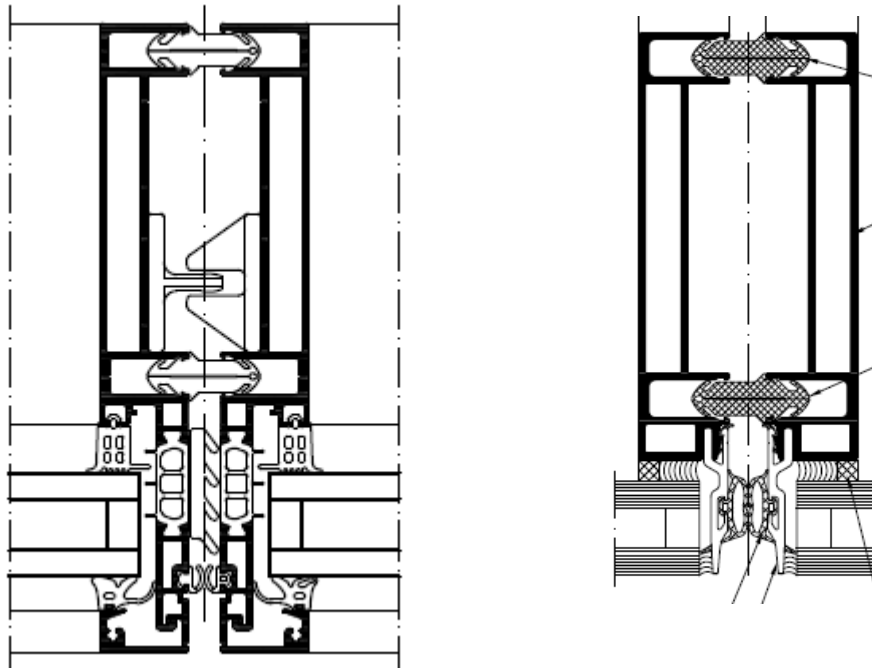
Typical unitised mullion layout with pressure plate system and structural silicone – note the split section to enable the curtain walling to be delivered in units (Schueco International KG 2009, p.USC 65)
